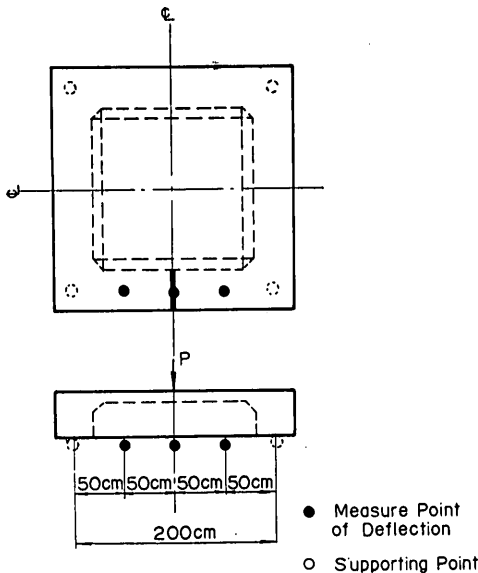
Loading Test of Boundary Frame (Slab XC-4)
